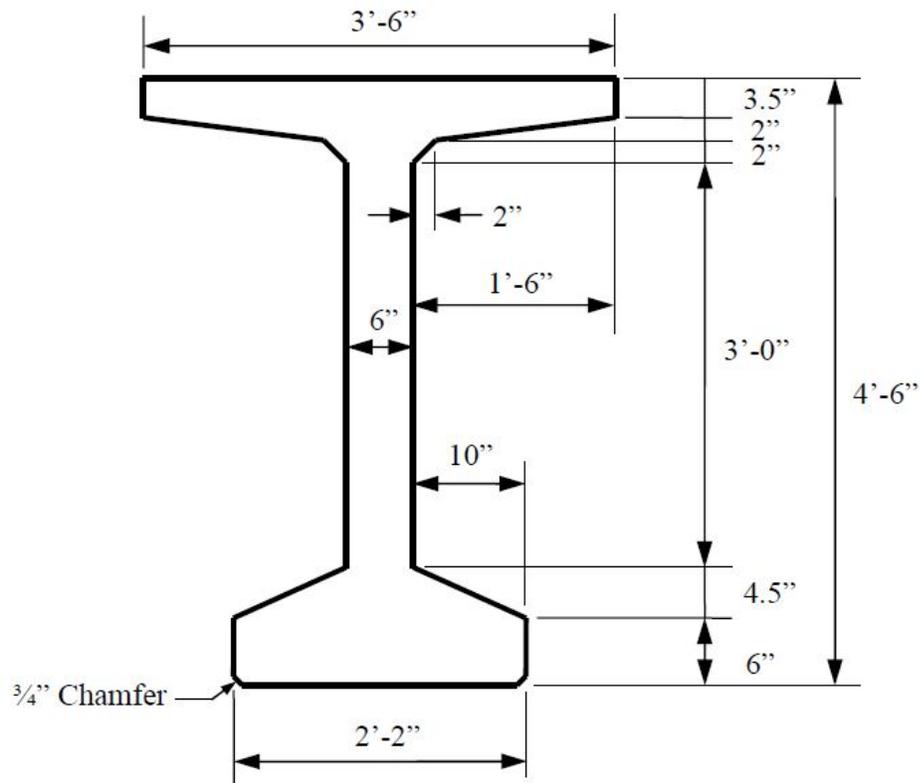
Typical BT-54 girder cross-sectional dimensions
